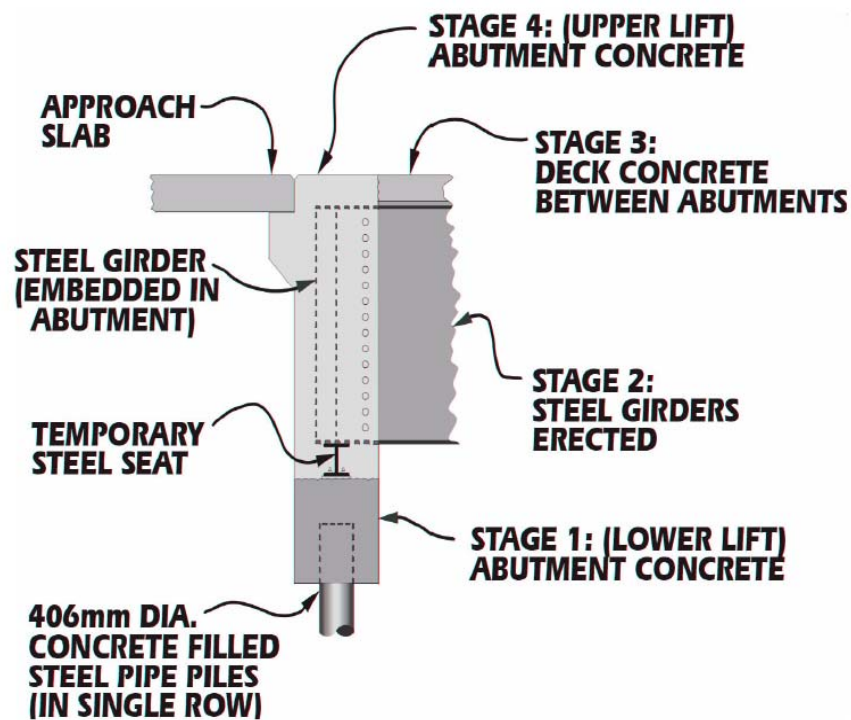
Typical Construction Stages for IABs (Harvey et al. 2006)
